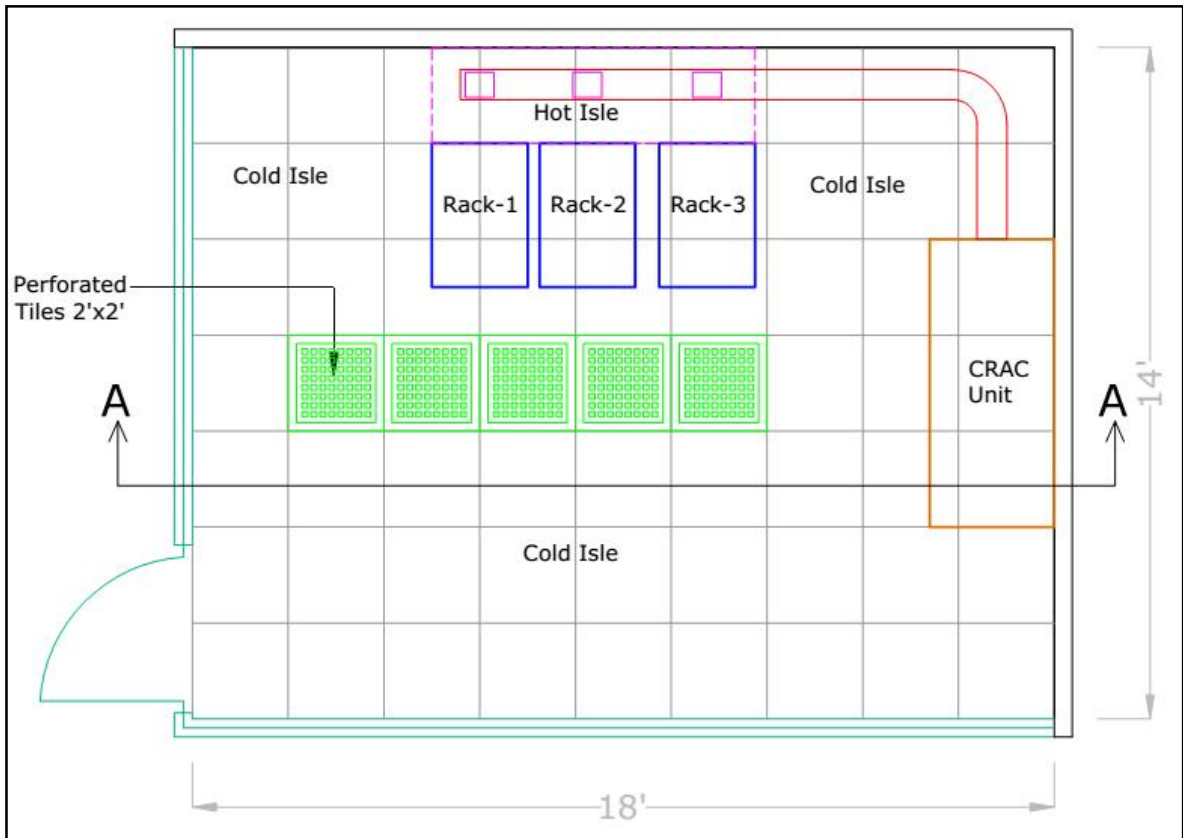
RCMS Data Centre Proposed HVAC Layout Plan
